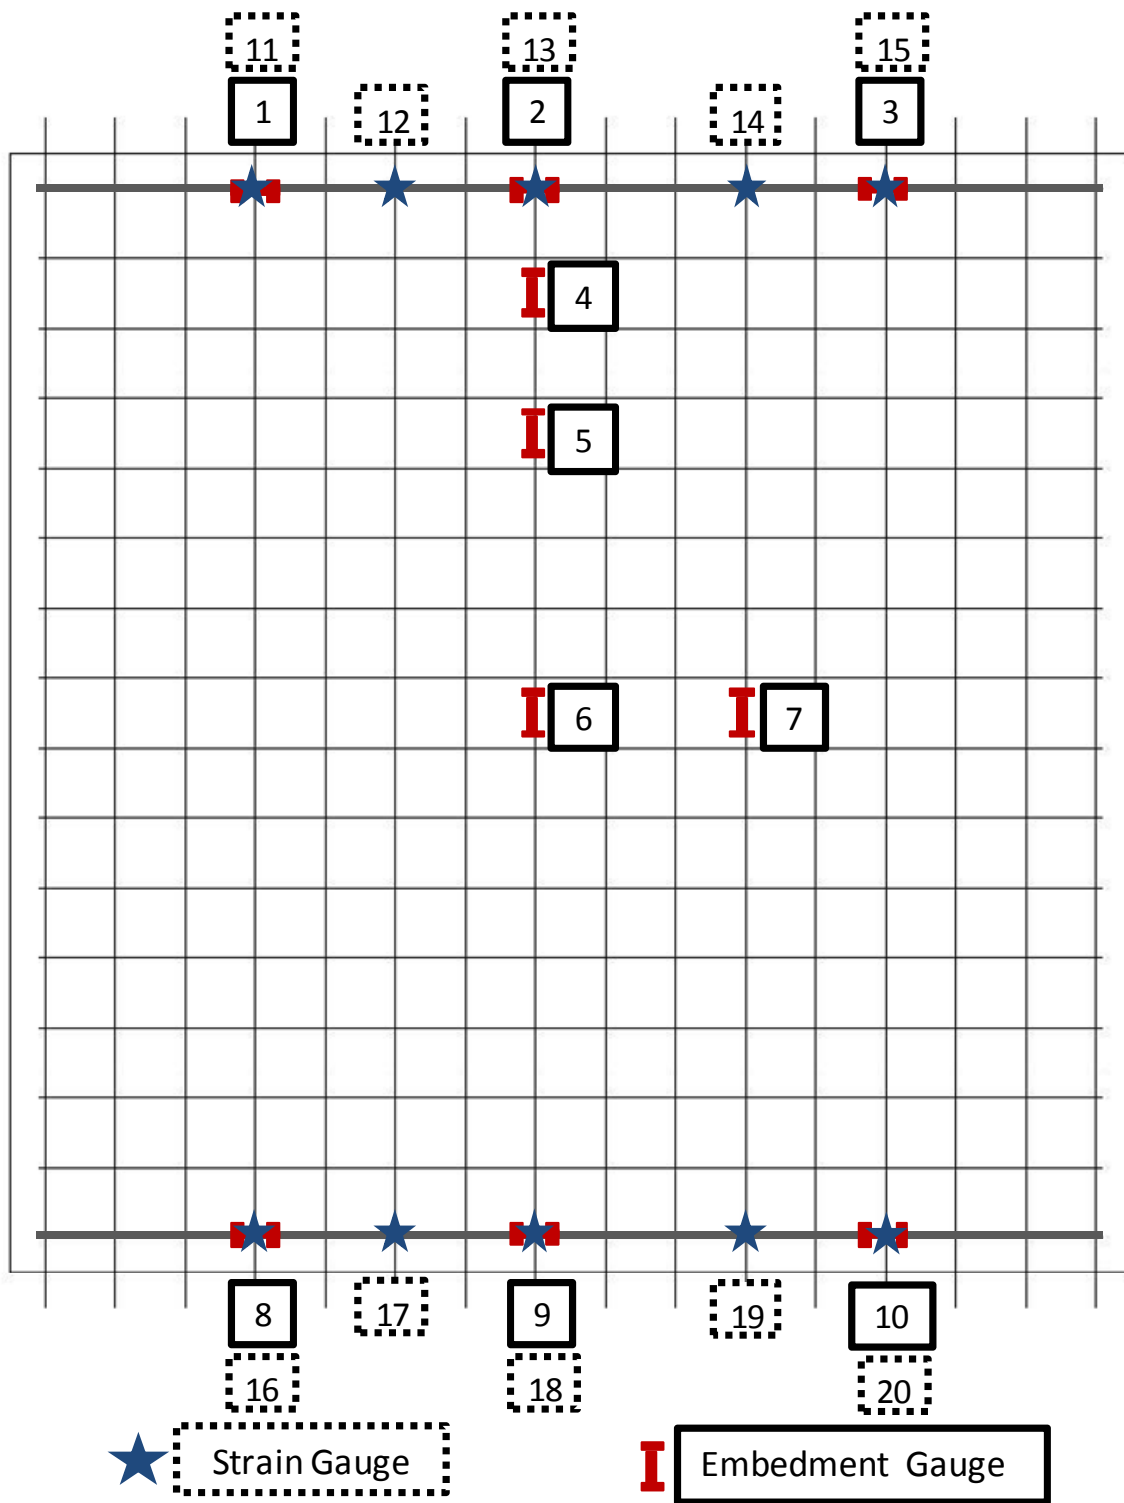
Gage layout and numbering scheme for Panels C1 and C2
